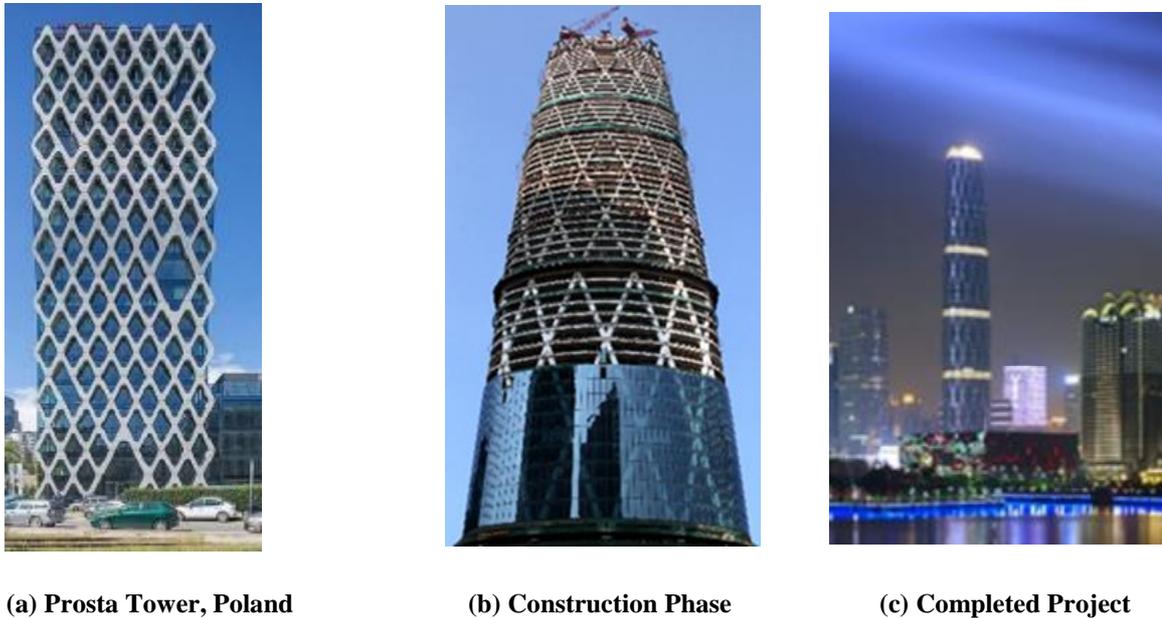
Existing Diagrid Buildings (a) Prosta Tower, (b) and (c) Guangzhou International Finance Center, China
